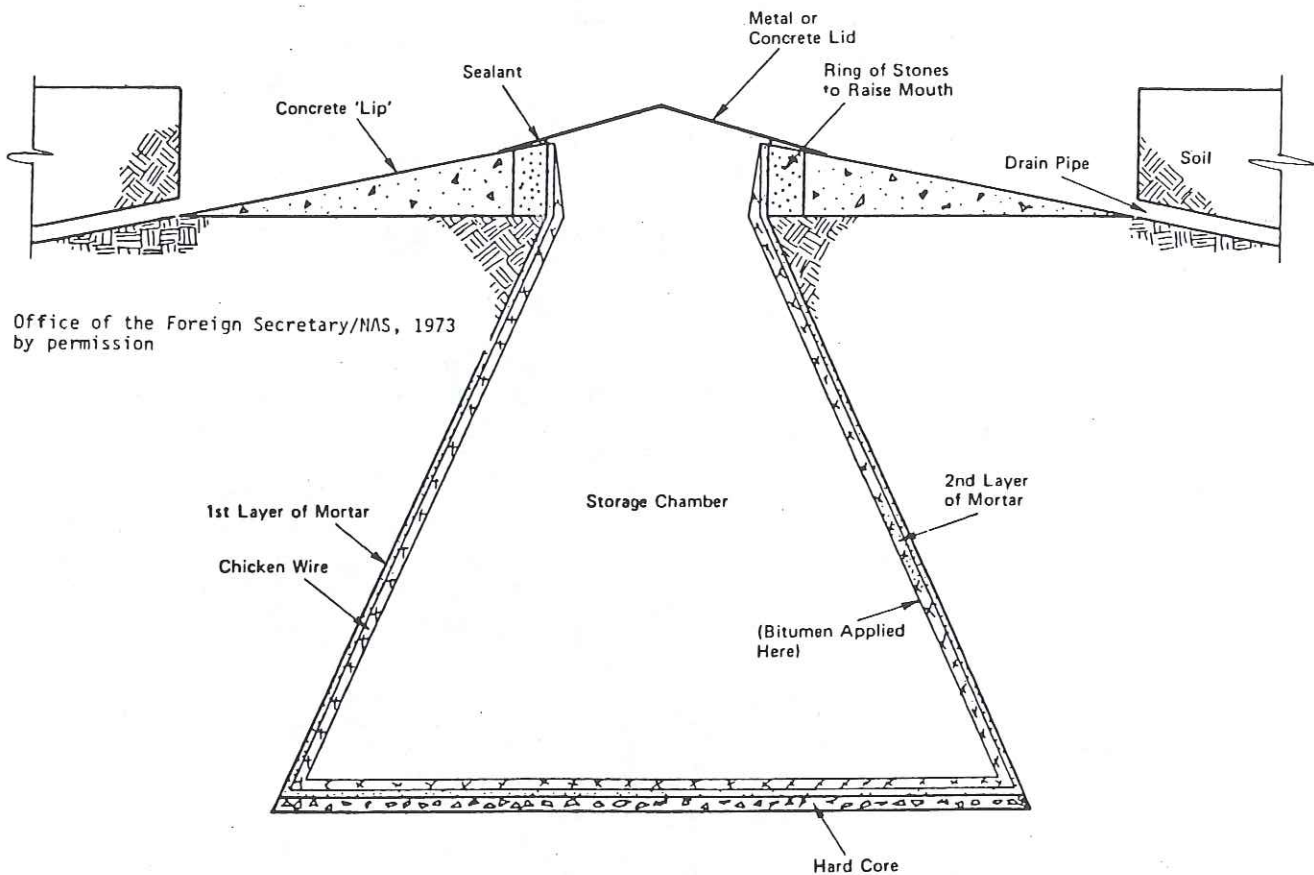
, Cross-section of Ferrocement-lined Underground Storage Pit.
